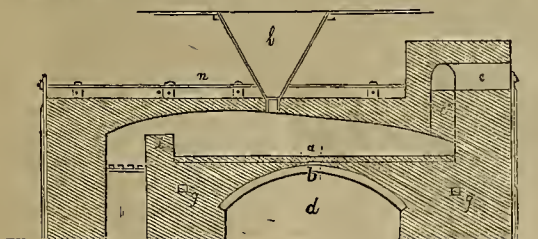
SMALL ROASTING FURNACE, CROSS SECTION.
